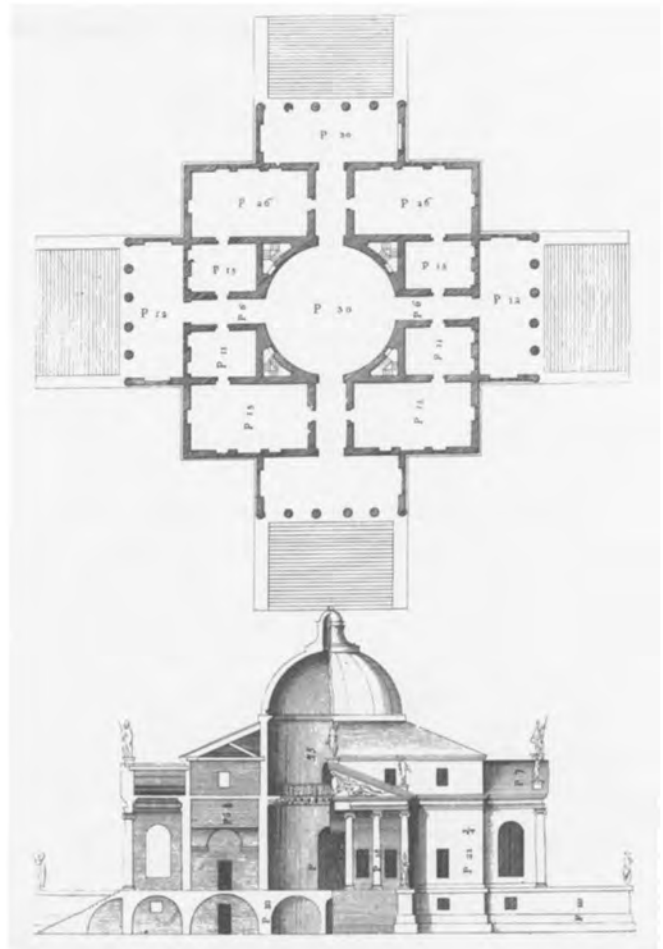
Palladio. Vicenza, Villa Rotonda. Plan and elevation/section in Isaac Ware’s edition of *Palladio* (London, 1738).
